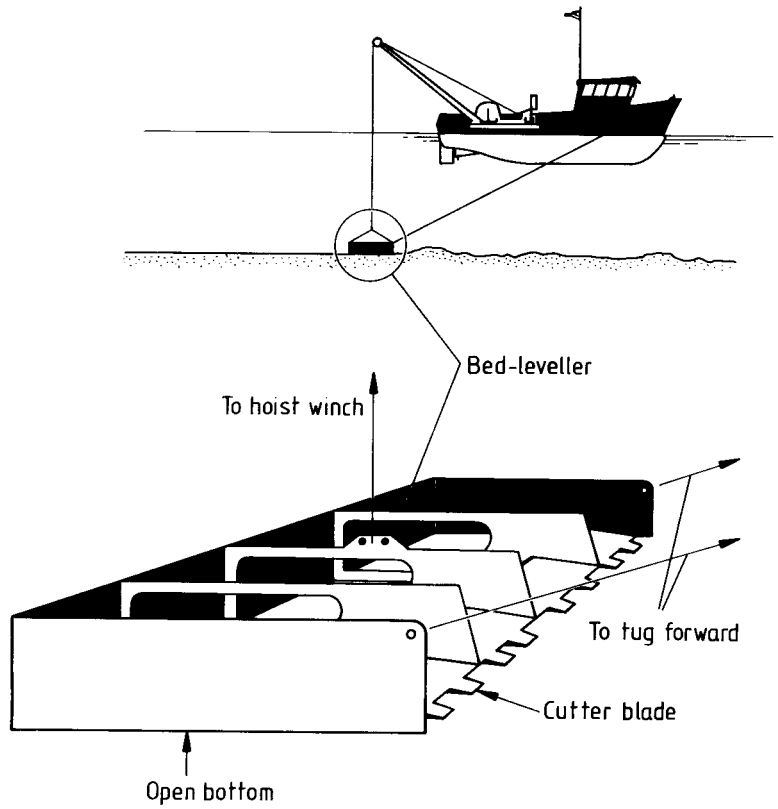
Deployment method for bed-leveller and typical bed-leveller assembly
